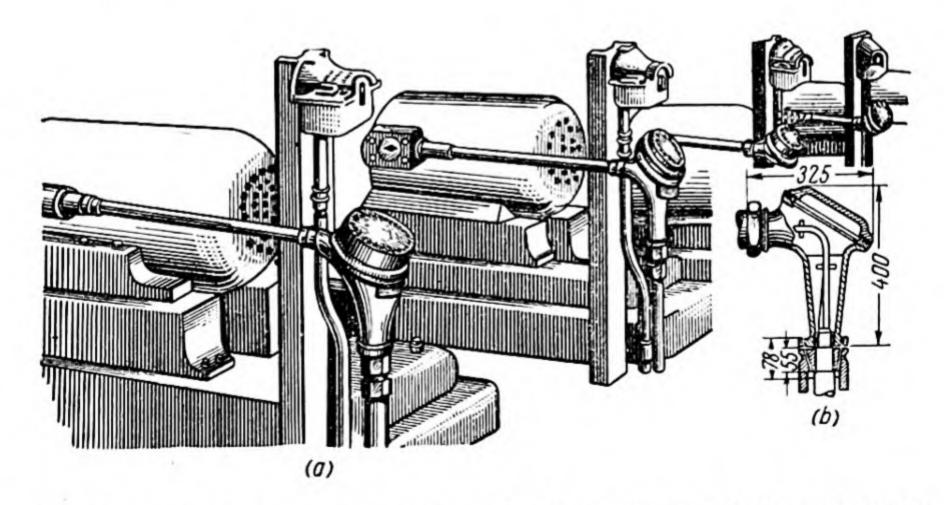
Conduit piping connections to electric motors and starting apparatus:
